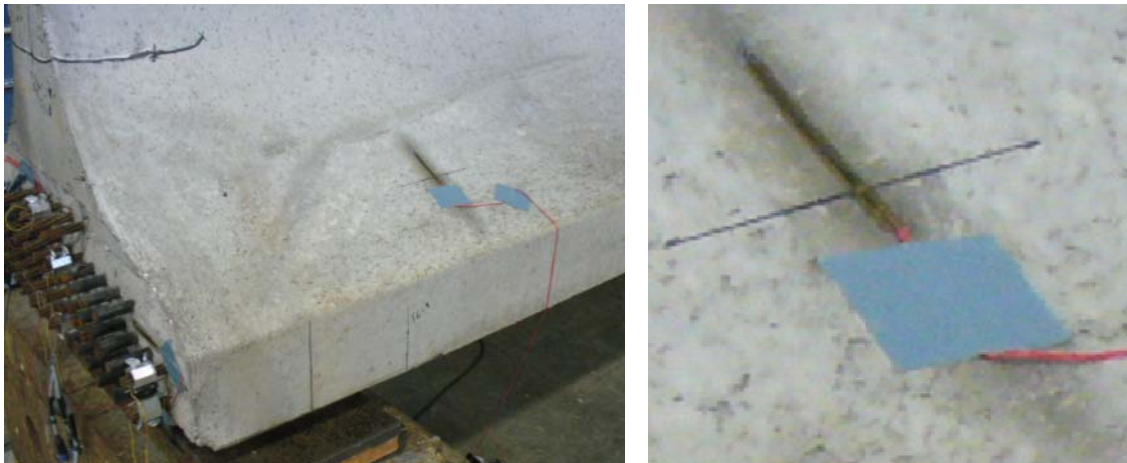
S gage installation on bottom flange (left) and close-up (right)
